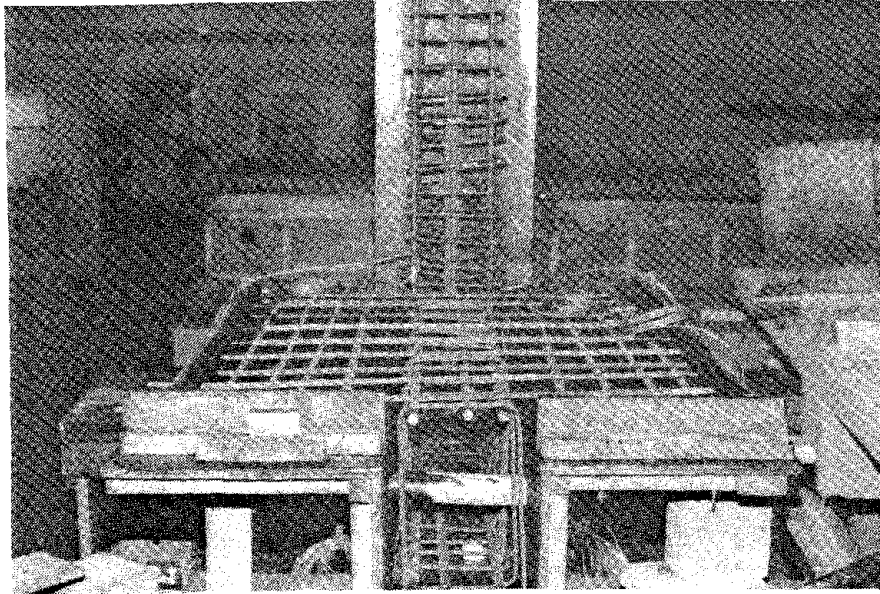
Specimen 7 Prior to Casting of the Beam and Slab Concrete.
